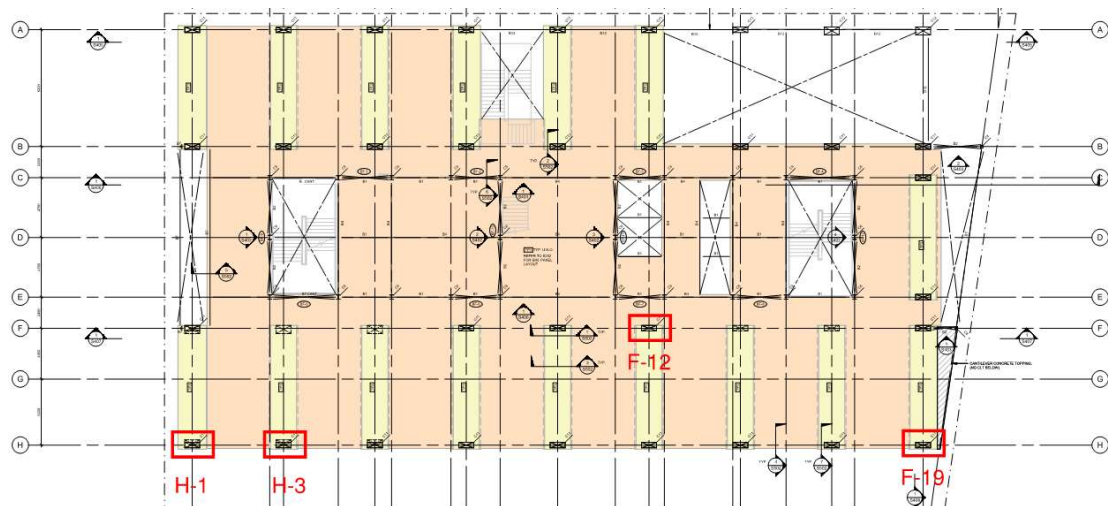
Columns considered for progressive collapse: corner columns H-1 and F-19, edge column H-3 and interior column F-12.
